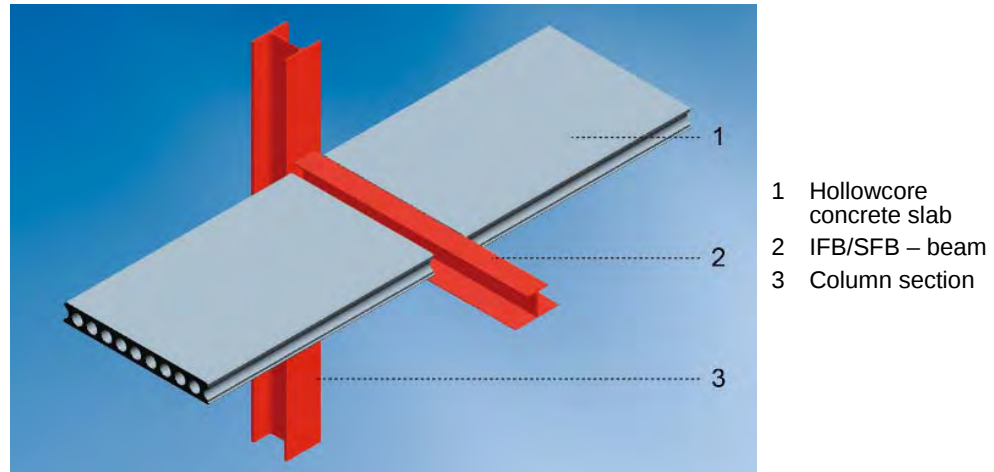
Integrated floor beam (slim floor beam) and precast concrete units
